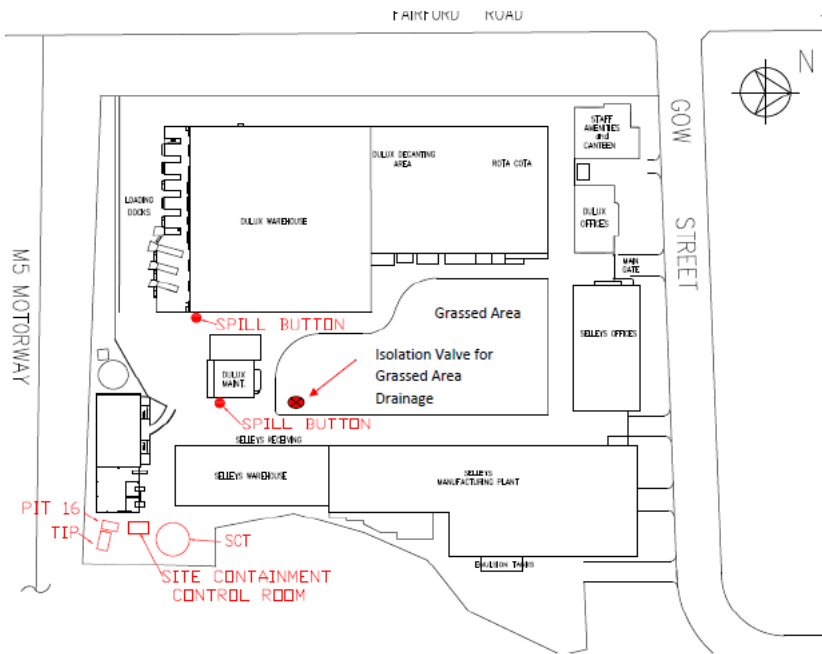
Locations of Spill Buttons, Pits, Triple Interceptor Pit and Site Containment Tank
